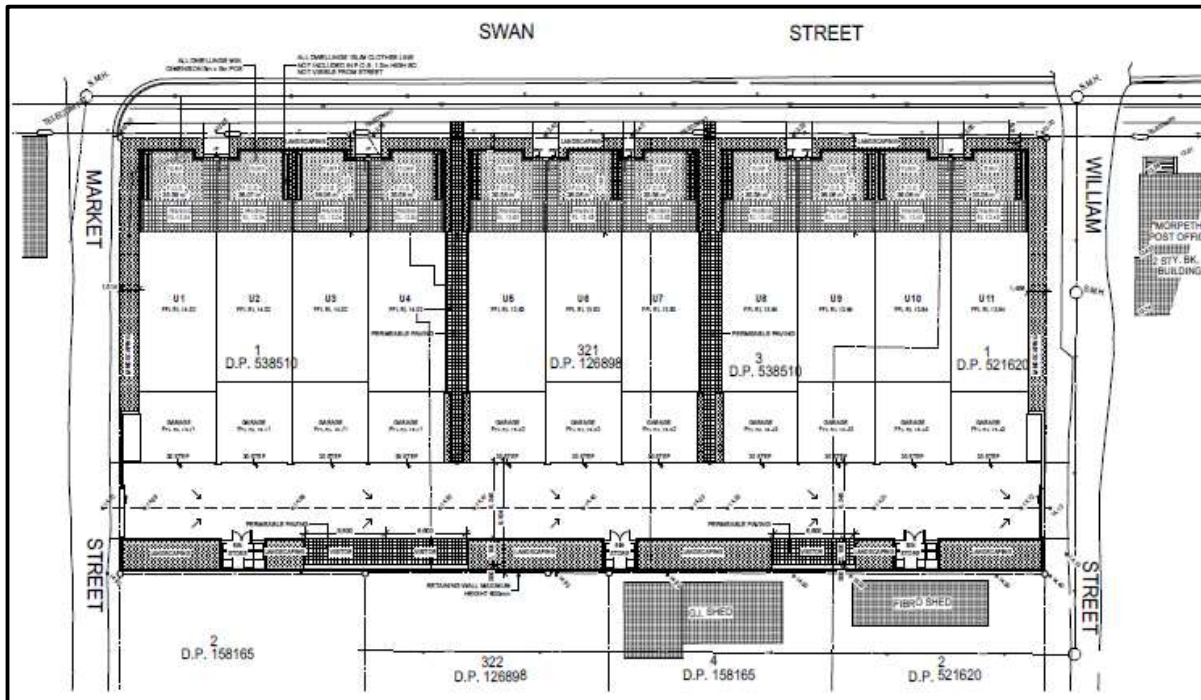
Proposed development layout (Sorensen Design, 2021)
